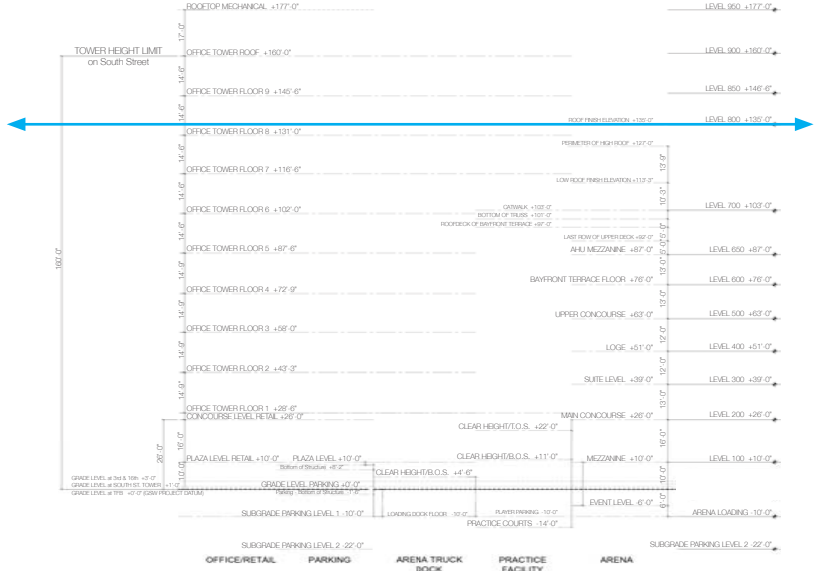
Event Center Roof: Gently sloped roof will measure  $\pm 135'0"$  at the center of the event center building and  $+125'0"$  on the exterior parapet (roof edge) of the event center building
